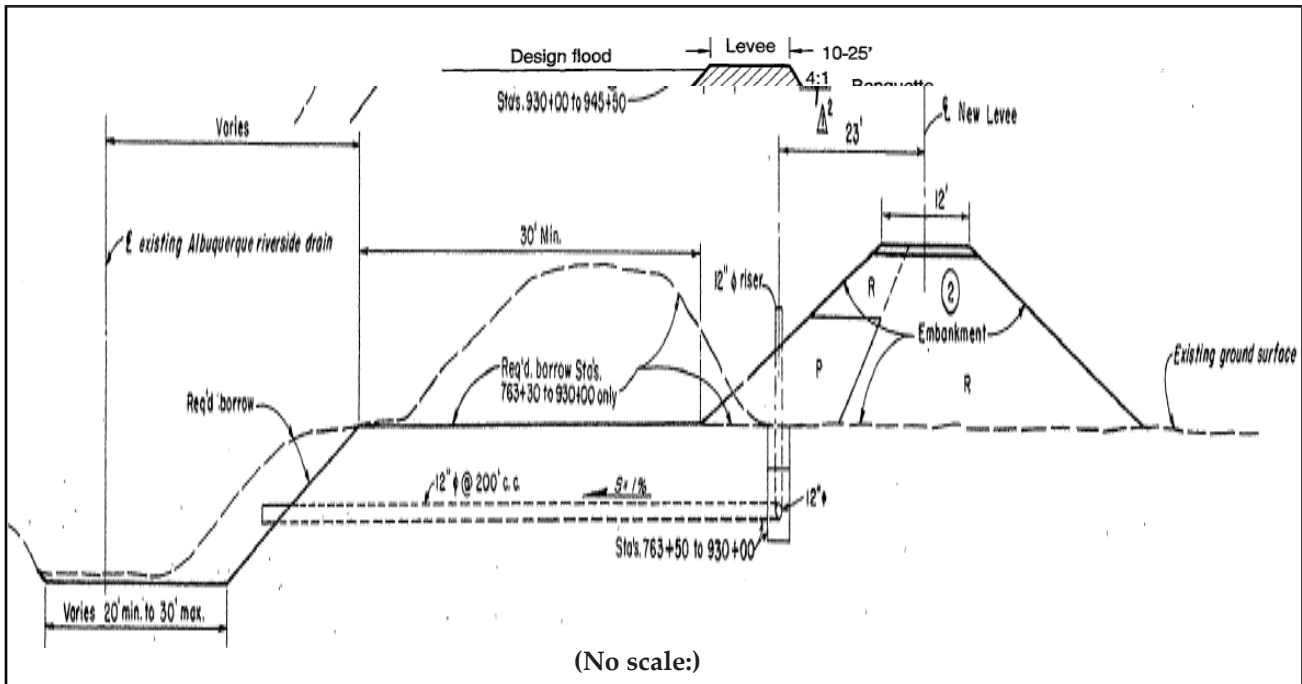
Typical levee section from the Albuquerque levees construction drawings
